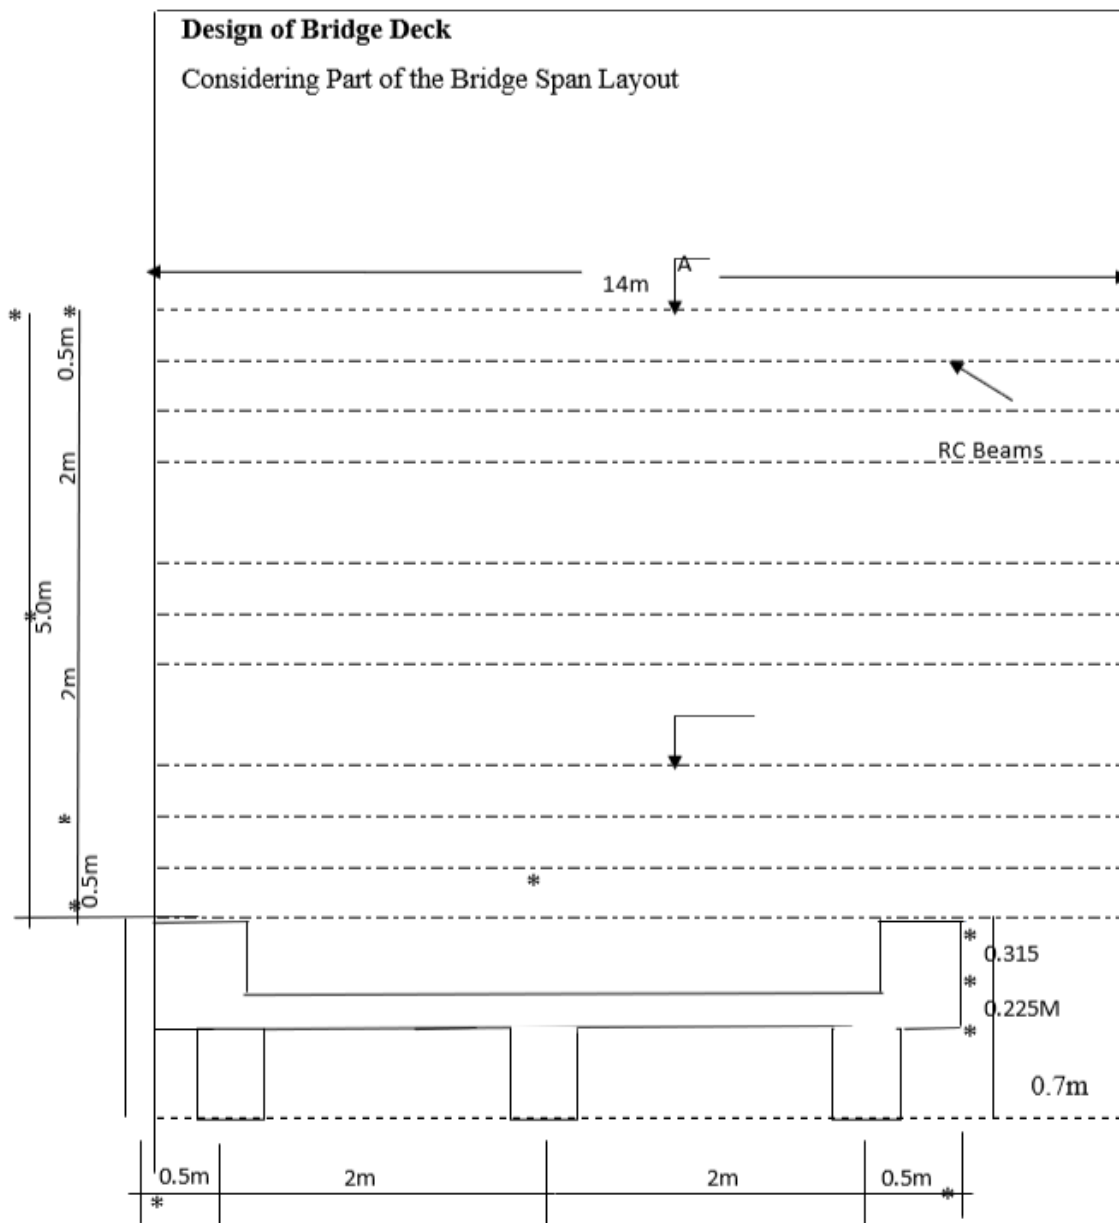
Sketch for Loading of Kyoho Plan Layout
